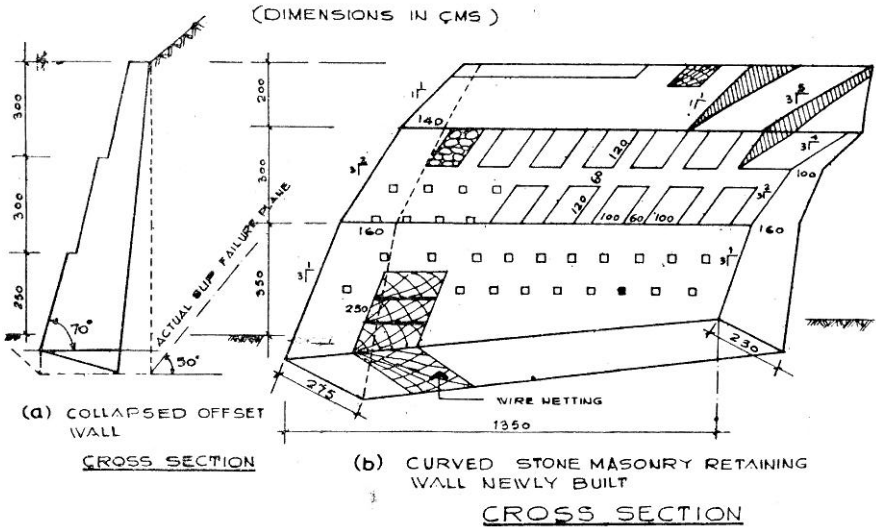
Details of offset wall and curved stone masonry retaining wall.
